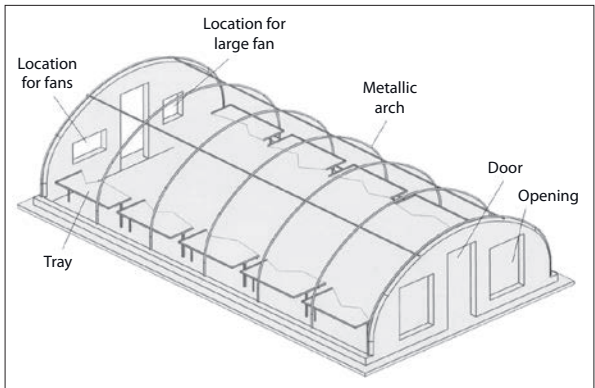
Greenhouse dryer structure (according to J. Brouat, CIRAD).
